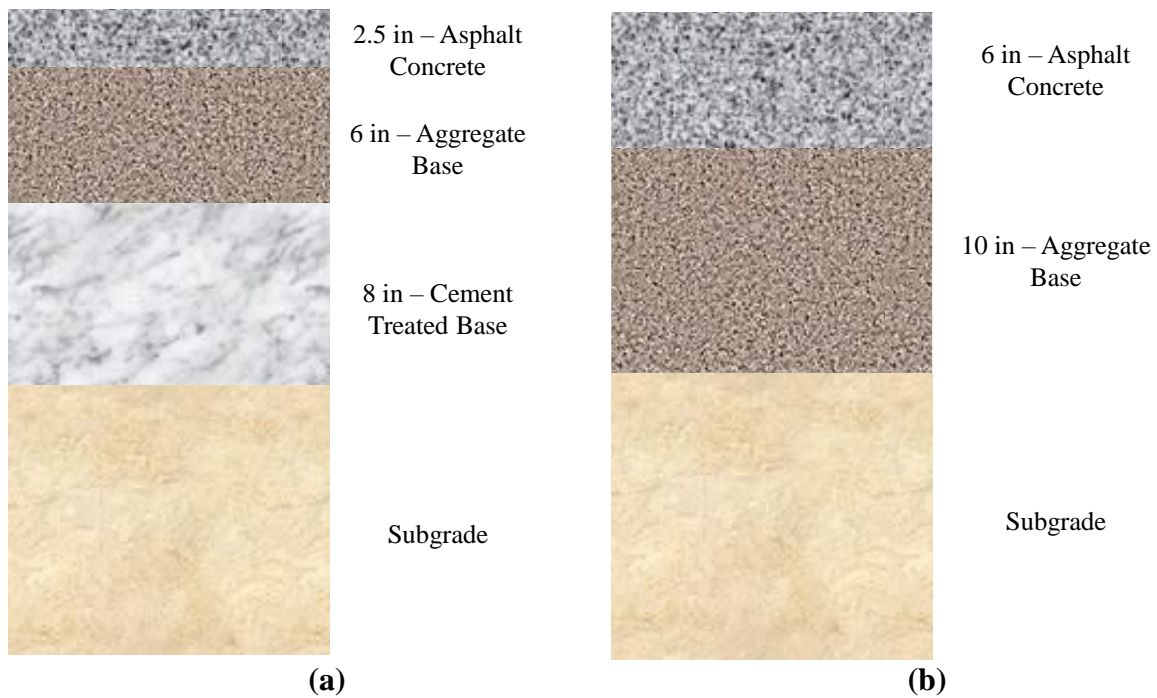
Pavement designs in Pineville quarry site; (a) inverted pavement design and (b) conventional pavement design.
